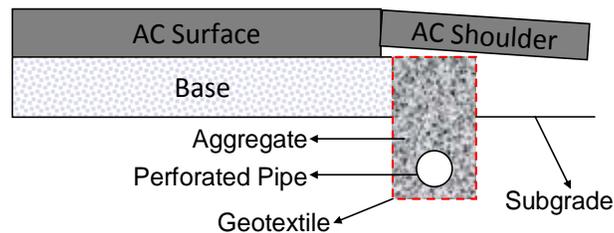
Geotextile used for trench drain in roadway (redrawn from AASHTO 2006)
